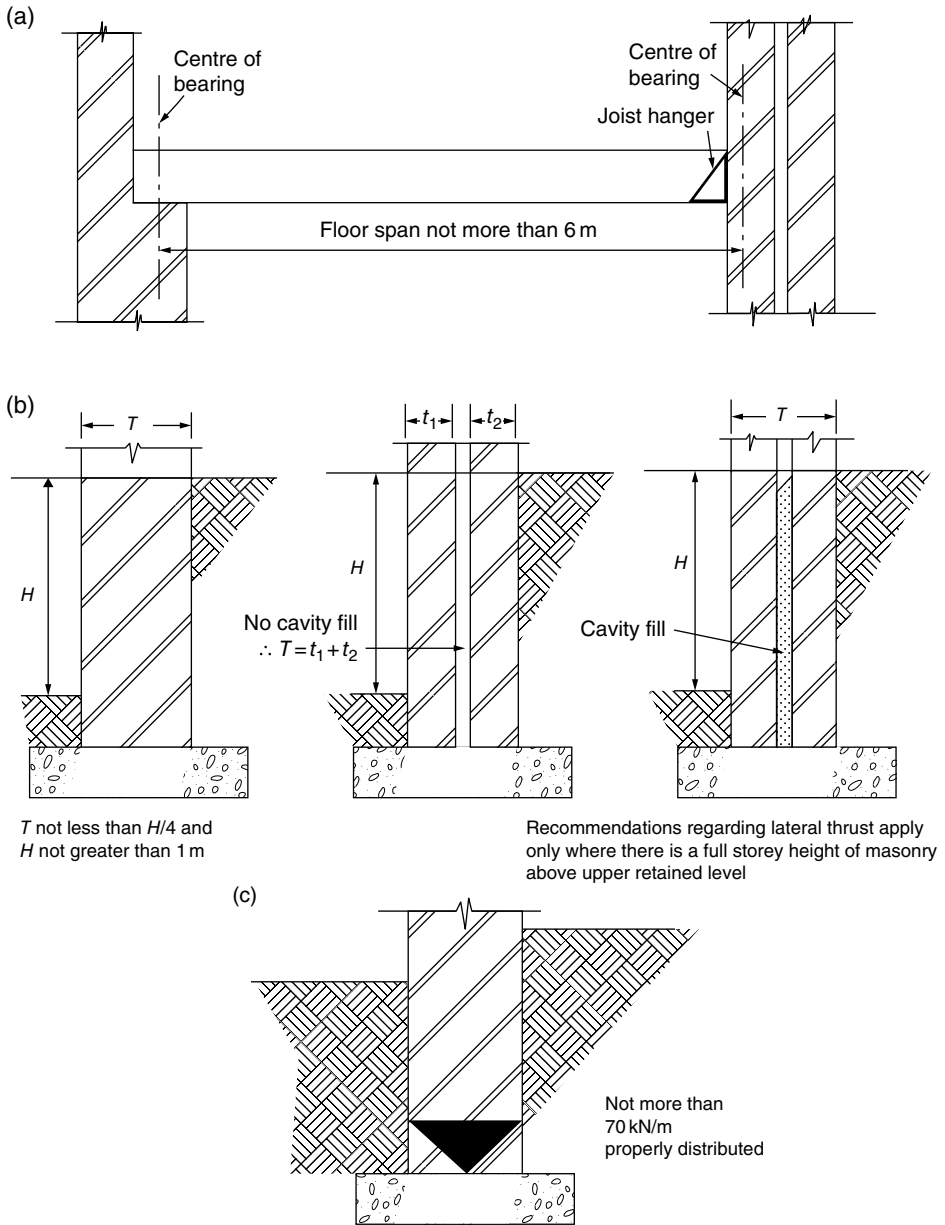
Loading requirements: (a) floor span, (b) lateral thrust and (c) vertical loading.
